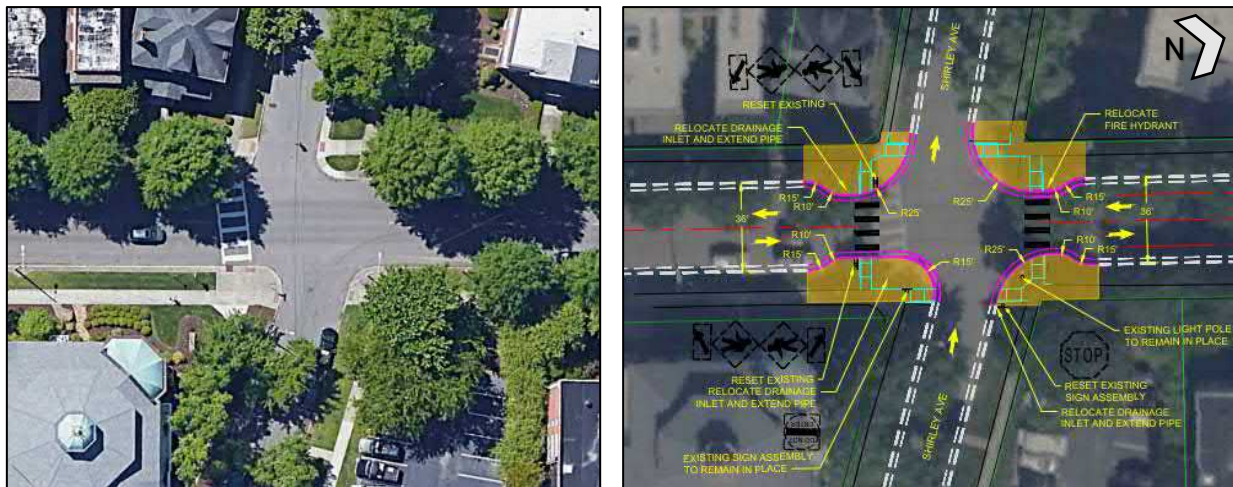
Existing Shirley Avenue Crosswalk Signage
